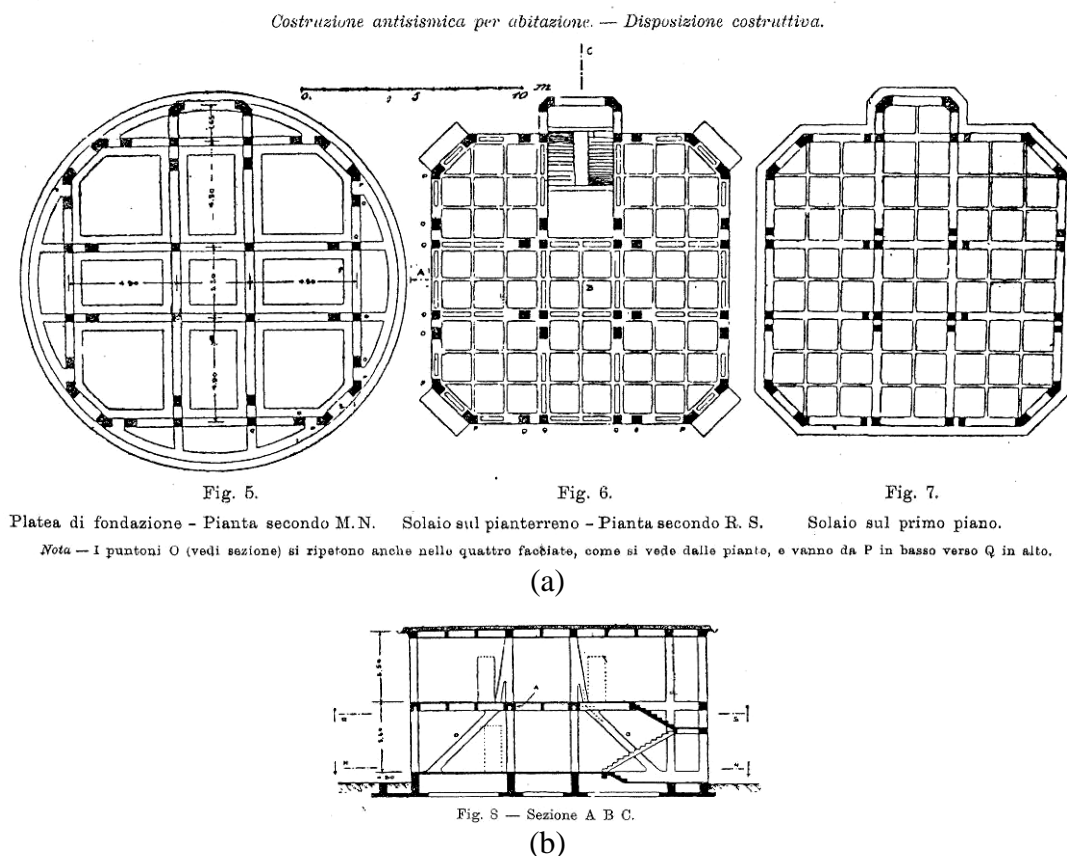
Danusso's earthquake-resistant building, a reinforced concrete frame: (a) Plans at foundation, at first and second level (from Danusso, 1910b); (b) Section
